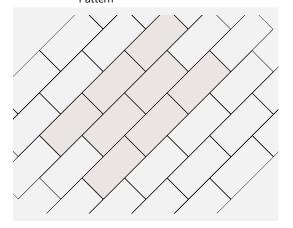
Vertical Sheeting – Stretcher Bond Pattern
